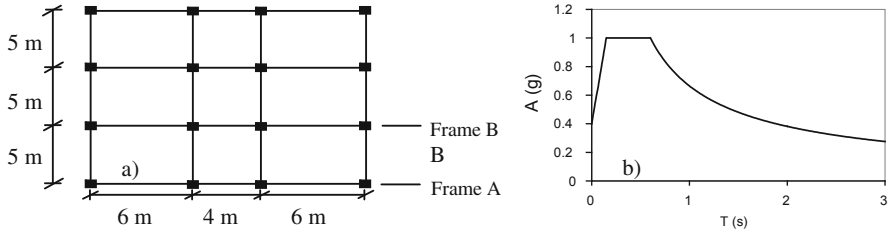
(a) Typical plan of the 12 story building, (b) design spectrum
